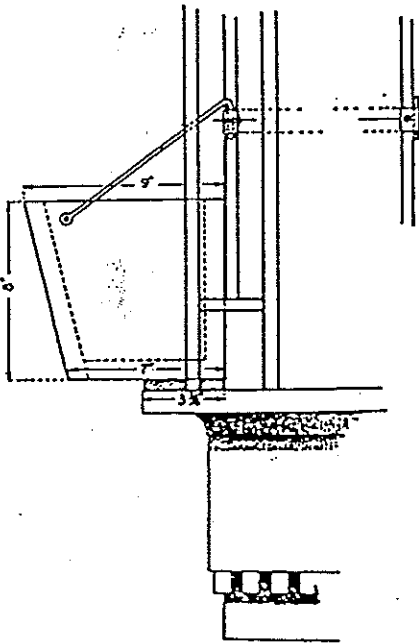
The fastening of a window box in front of a balcony railing, its base resting partly on the protruding floor of the balcony.
